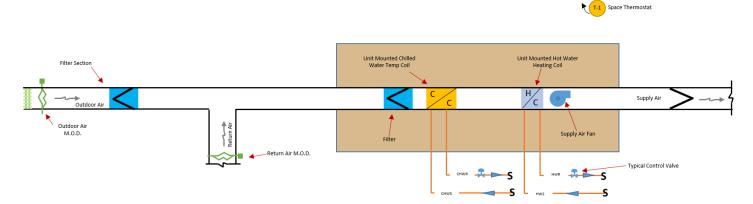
Typical 4-Pipe Air Handling Unit Diagram
